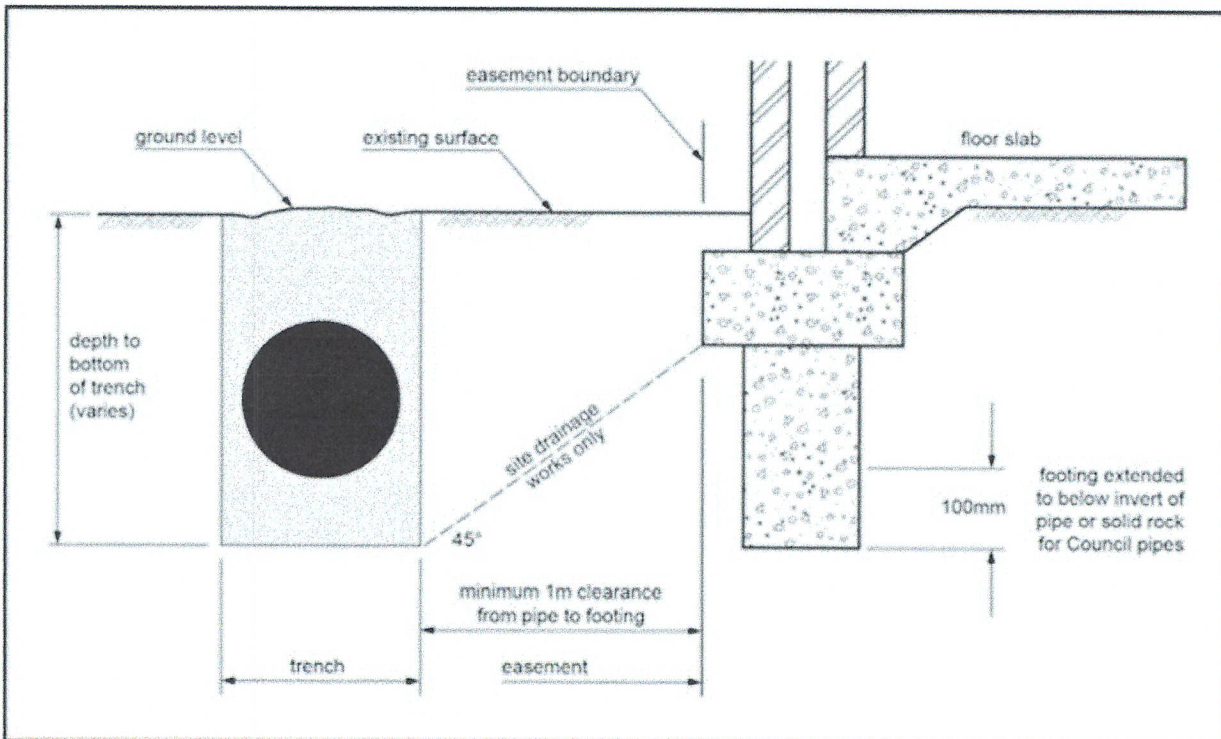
Building near and over stormwater and subsoil drains
